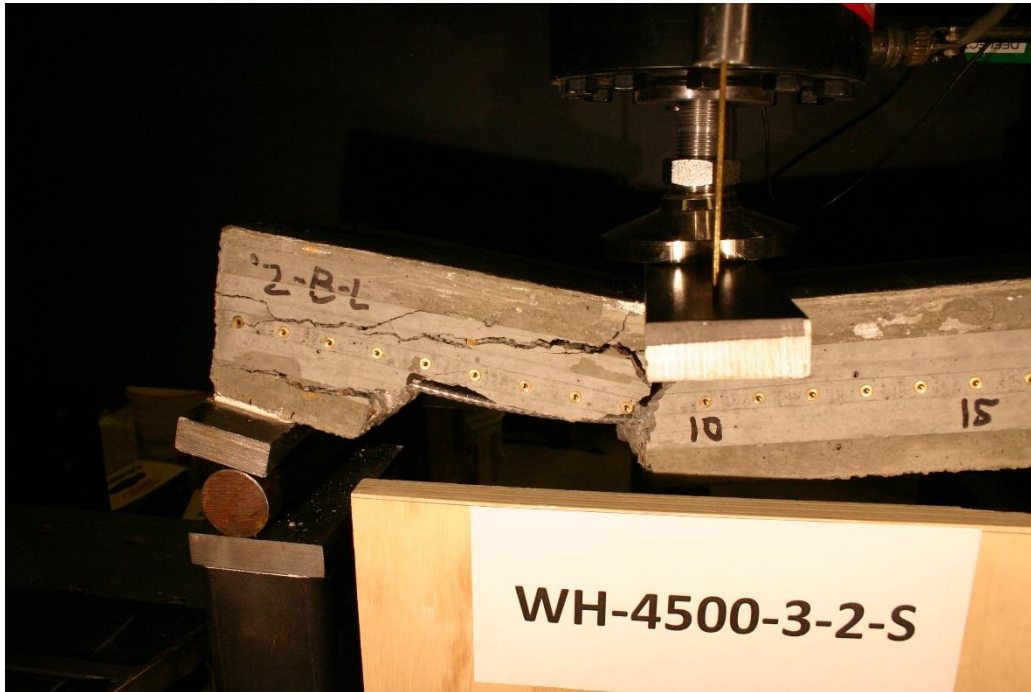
Picture of Failed Prism WH-4500-3-2-S
